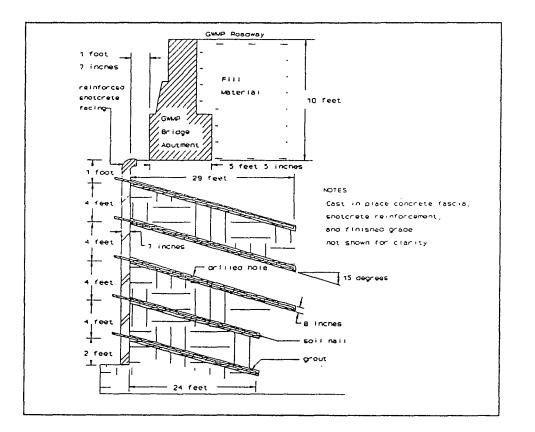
Typical section of Soil Nailed Retaining Wall under GWMP Bridge Abutment (Not to scale).
